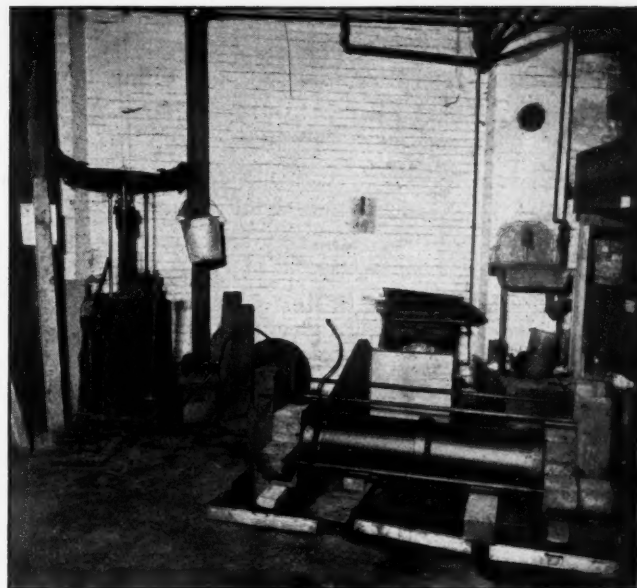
TESTING VITRIFIED PIPE BY HYDROSTATIC PRESSURE. SPECIMEN TESTED TO DESTRUCTION. TANKS FOR STORING CEMENT SPECIMENS AT RIGHT
